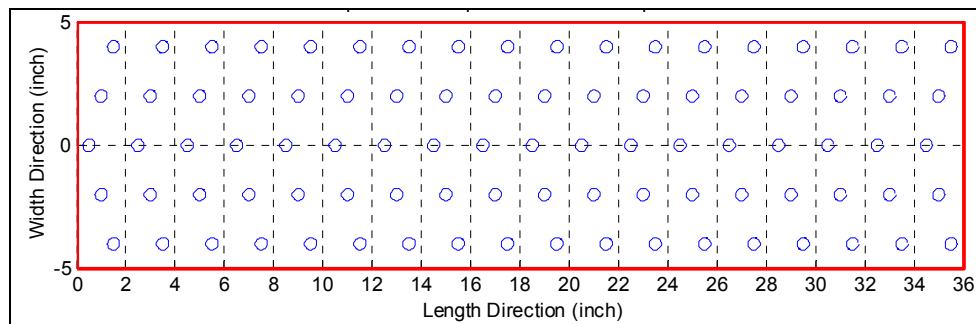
Top view of laboratory scale precast porous beam specimen.
